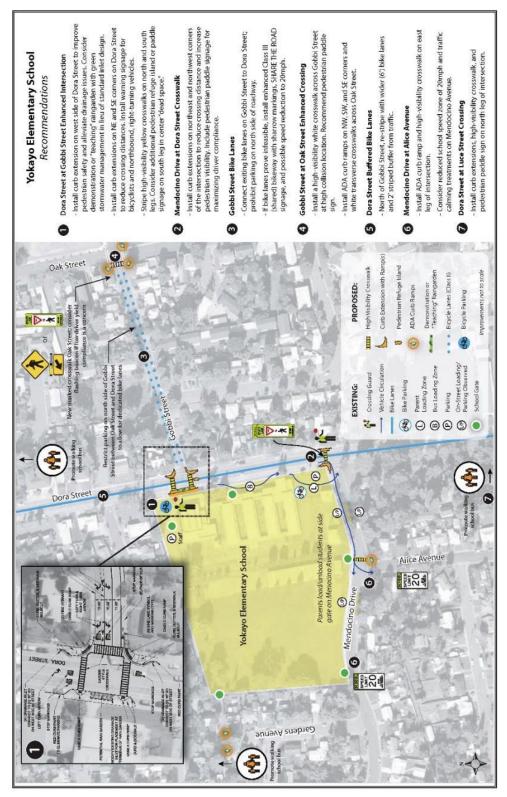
Yokayo Elementary School Pedestrian Improvement Recommendations (Ukiah Safe Routes to School Plan, 2009)
